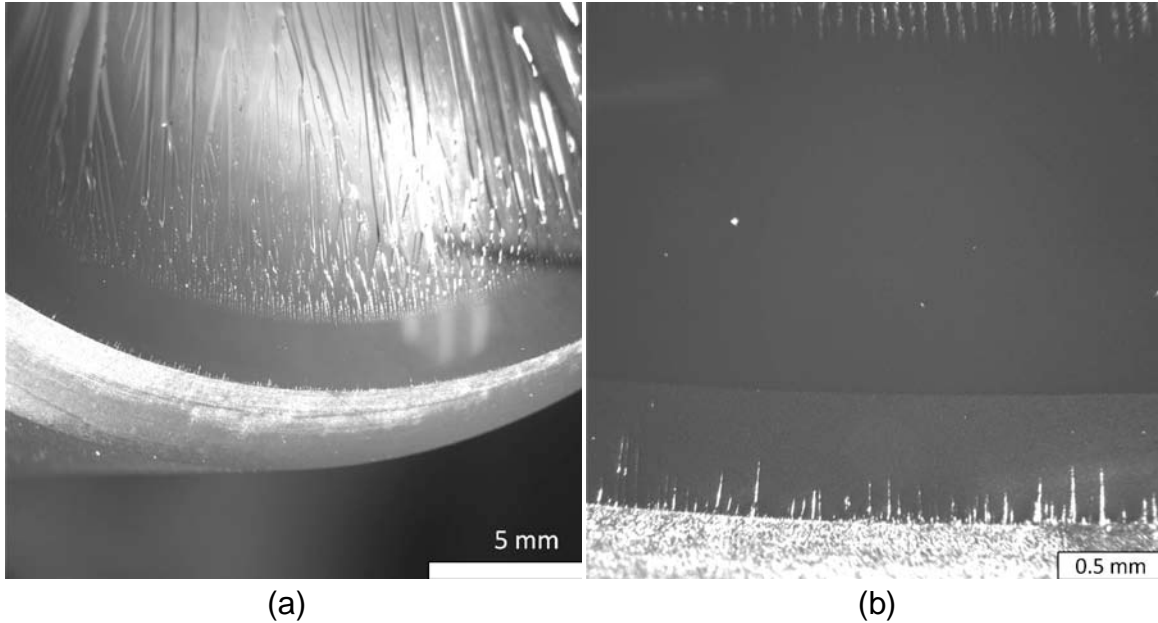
Images showing the fracture surface of GB3-3.
